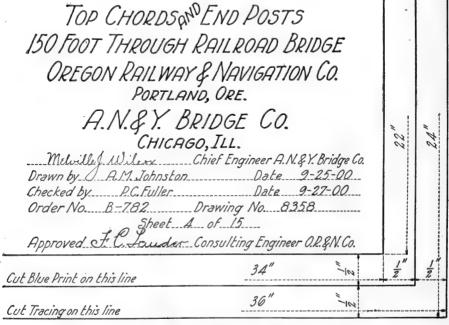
STANDARD SHEET AND TITLE FOR STRUCTURAL DRAWINGS.
